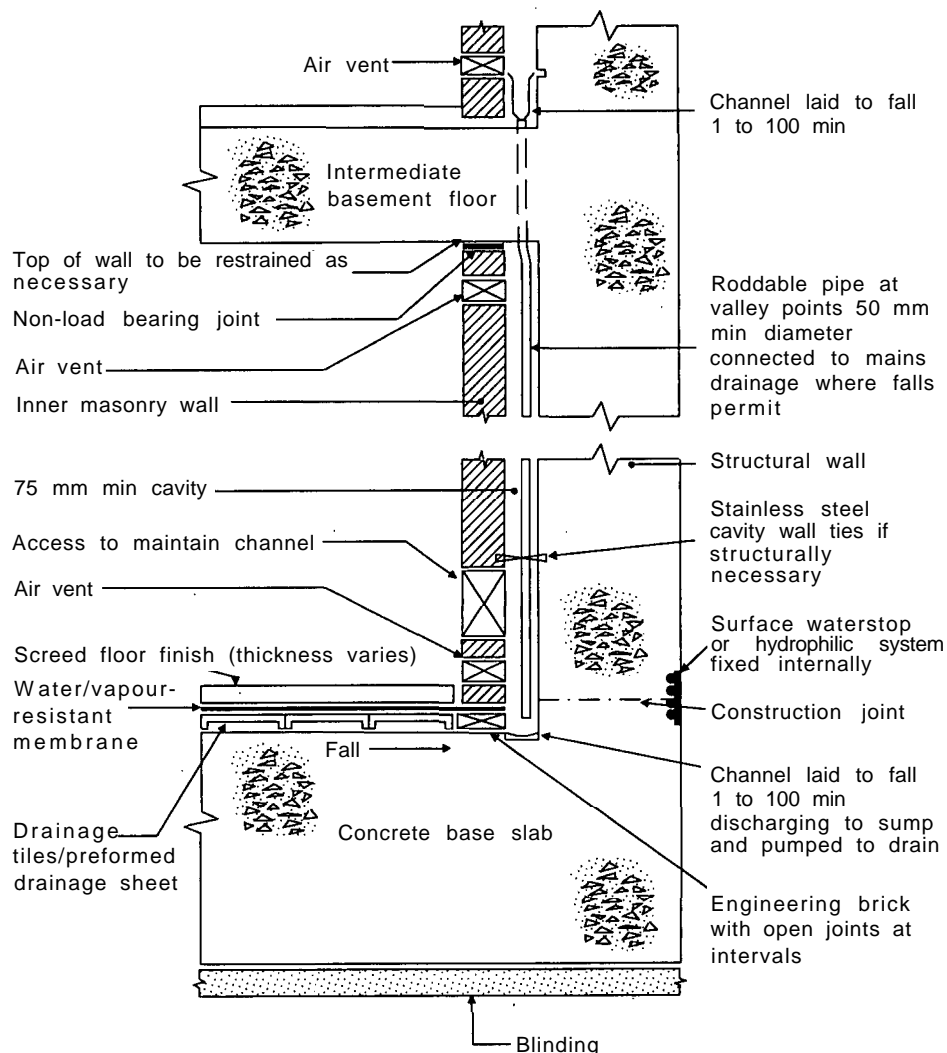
Concrete structure with drained wall and floor cavity (Type CBo)
